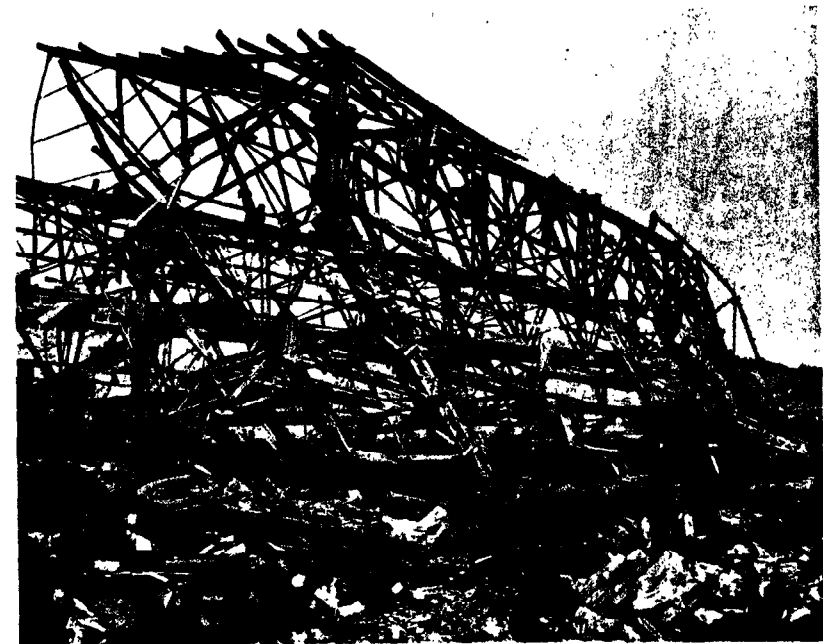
Industrial-type steel-frame building (0.35 mile from ground zero at Hiroshima). Wooden beams should be noted.
